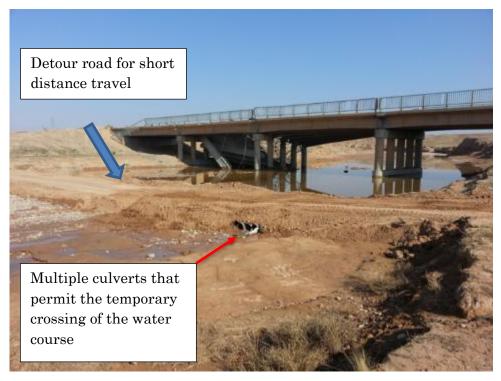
View on Bridge (4) and the temporary road currently used for short distance travel
